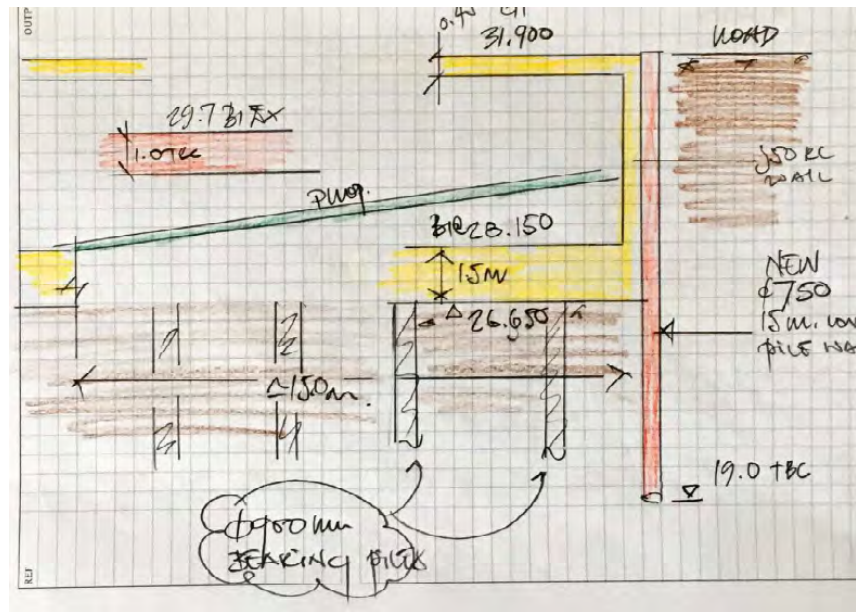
Typical Section – NEW Pile wall and Proposed Single level Basement
